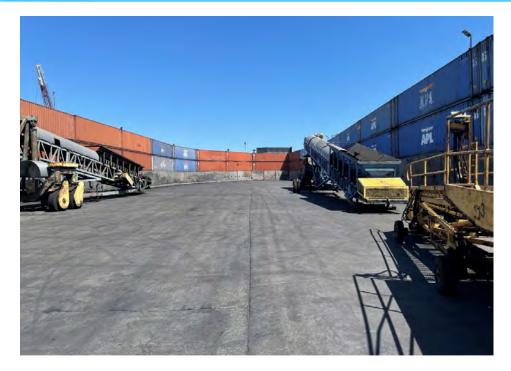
Looking north from the SW-3 drainage area toward the SW-4 drainage area, within the secondary bulk product storage area. Minor surficial cracking is visible throughout the area.
